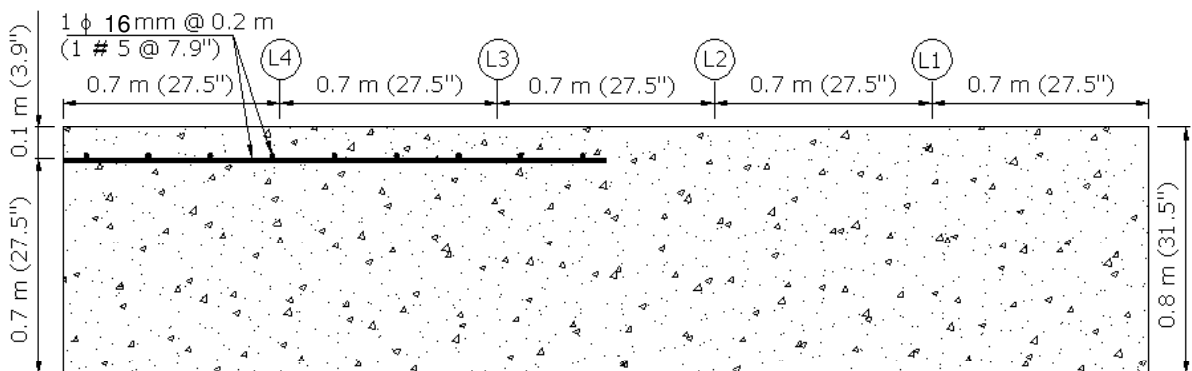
Longitudinal section of the homogeneous concrete slab.
